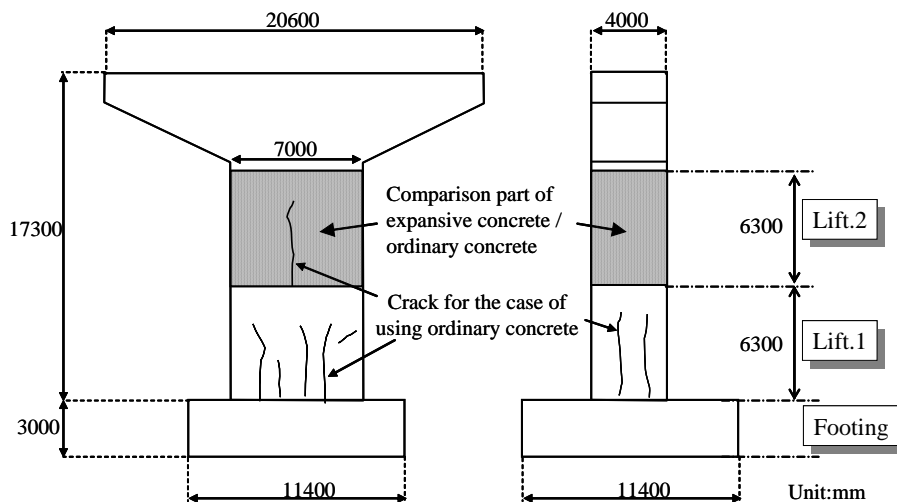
Outline of the pier structure and cracking in ordinary concrete (橋脚構造物概要および普通コンクリート適用時のひび割れ発生状況)
